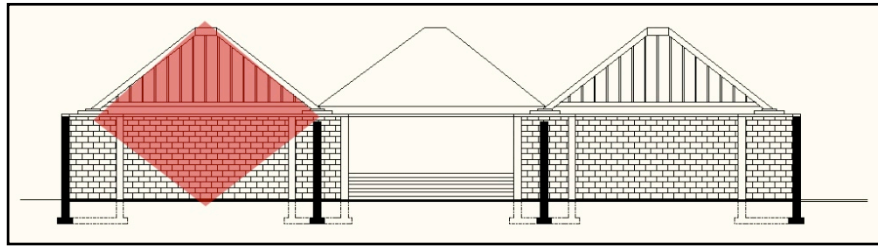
Relation of Plan and Section (Drawn by Author)
